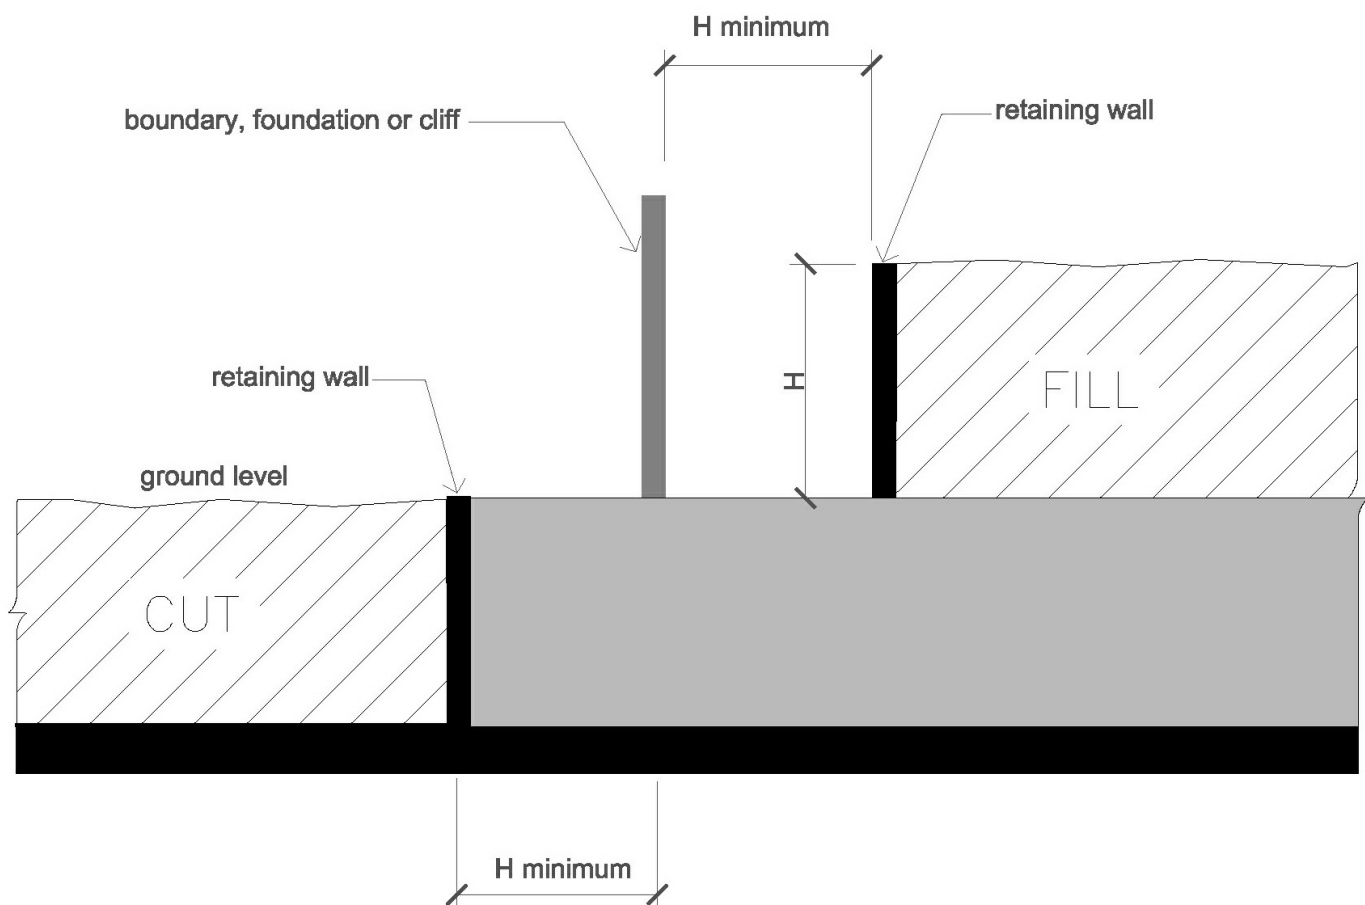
A.5B Cut and fill supported by retaining walls (elevation view)
